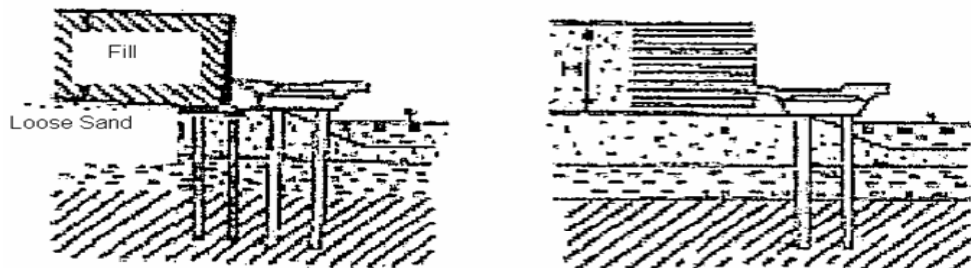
Solutions by reinforced earth method -transportation structure (Craig, 1987)
